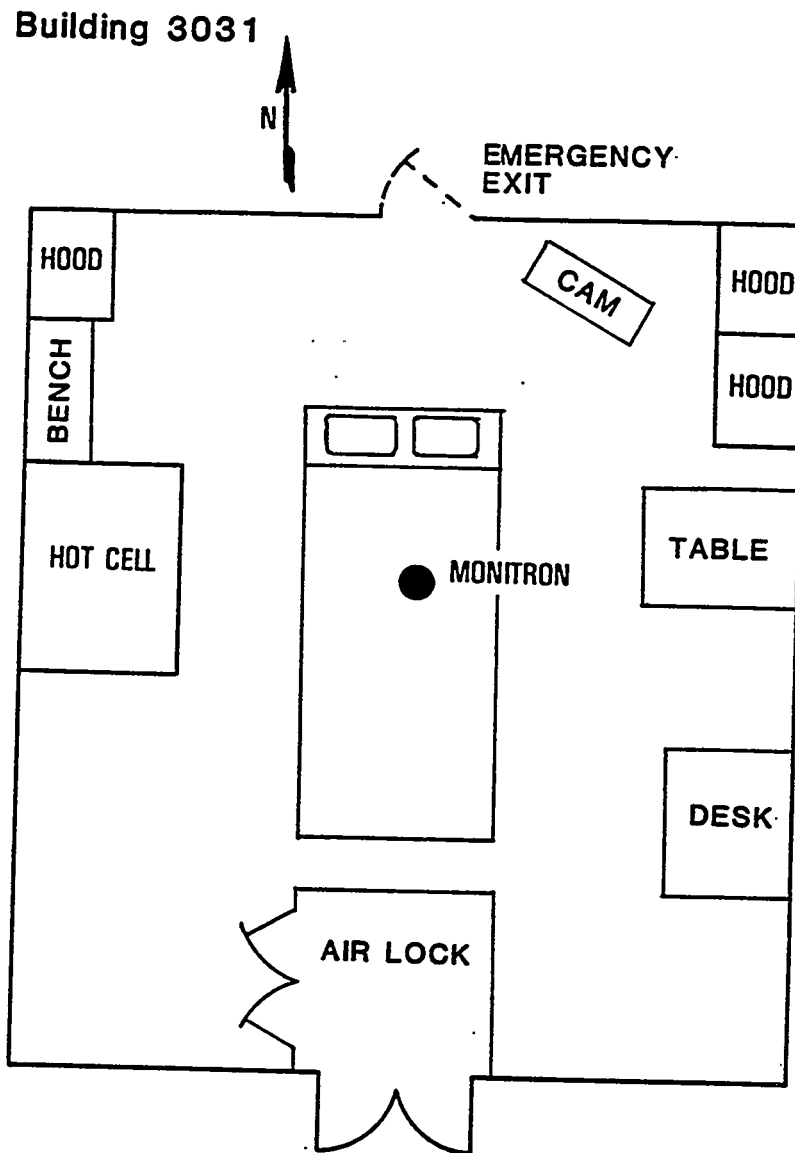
Floor plan of Building 3031—Radioisotope Development Facility.
